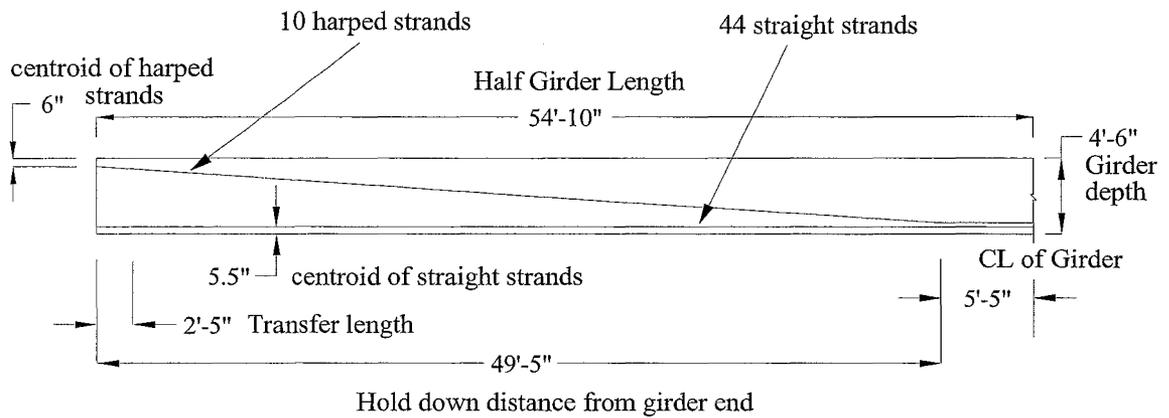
Longitudinal Strand Profile (half of the girder length is shown)
